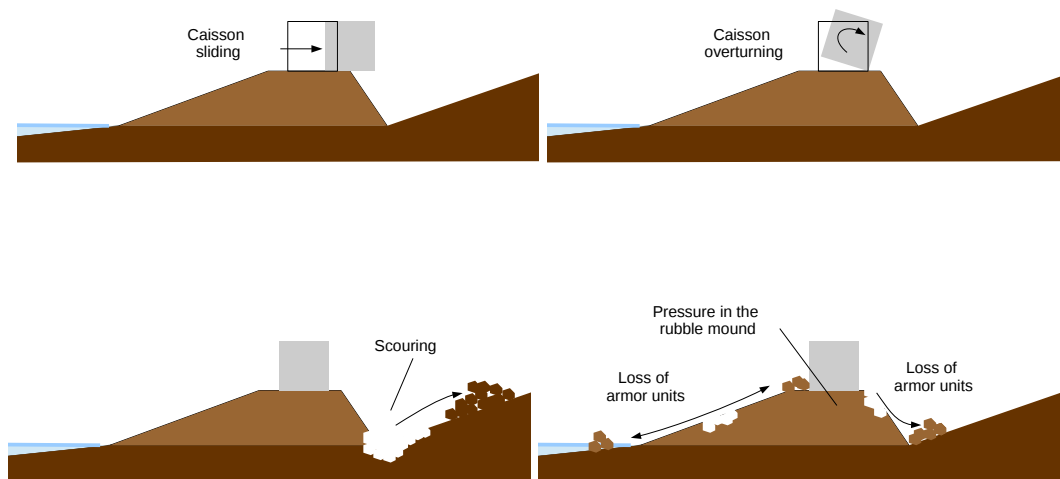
Failure mechanisms of offshore breakwaters: Sliding and tilting of caissons, global stability and scouring of rubble mound foundations.
